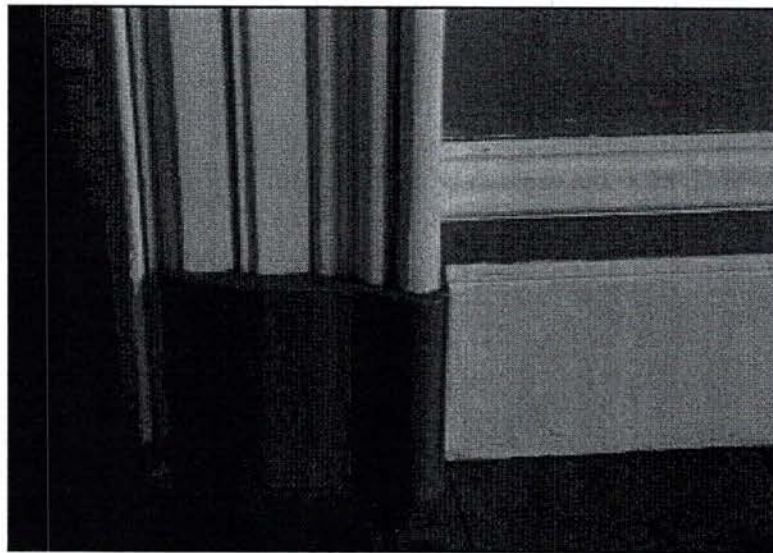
The base of the door and window frames in Rooms 102 and 104 has a more decorative base than is found in Rooms 100 and 103.
